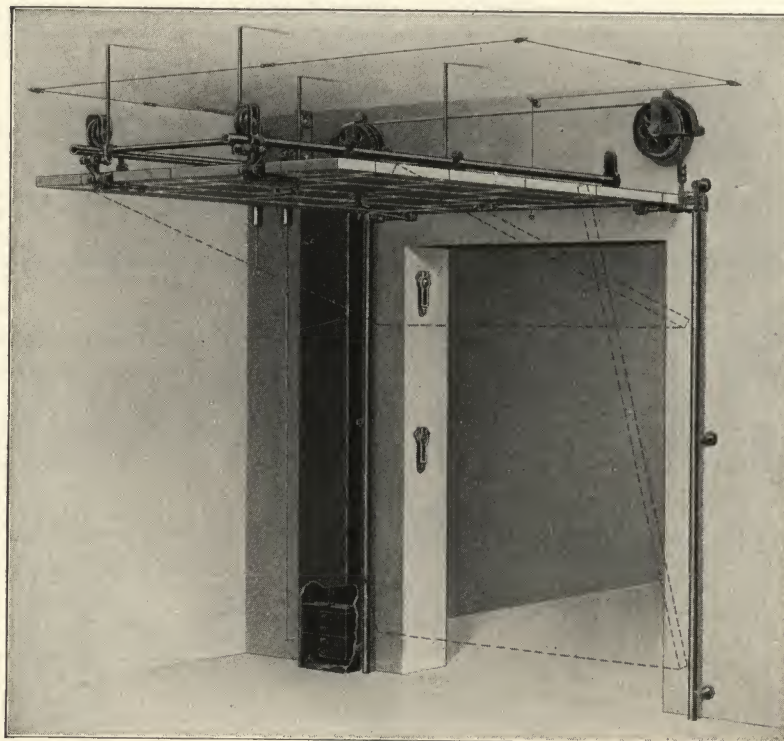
No. 649 Fire Door Fixtures Applied to Tin Clad Fire Door.
